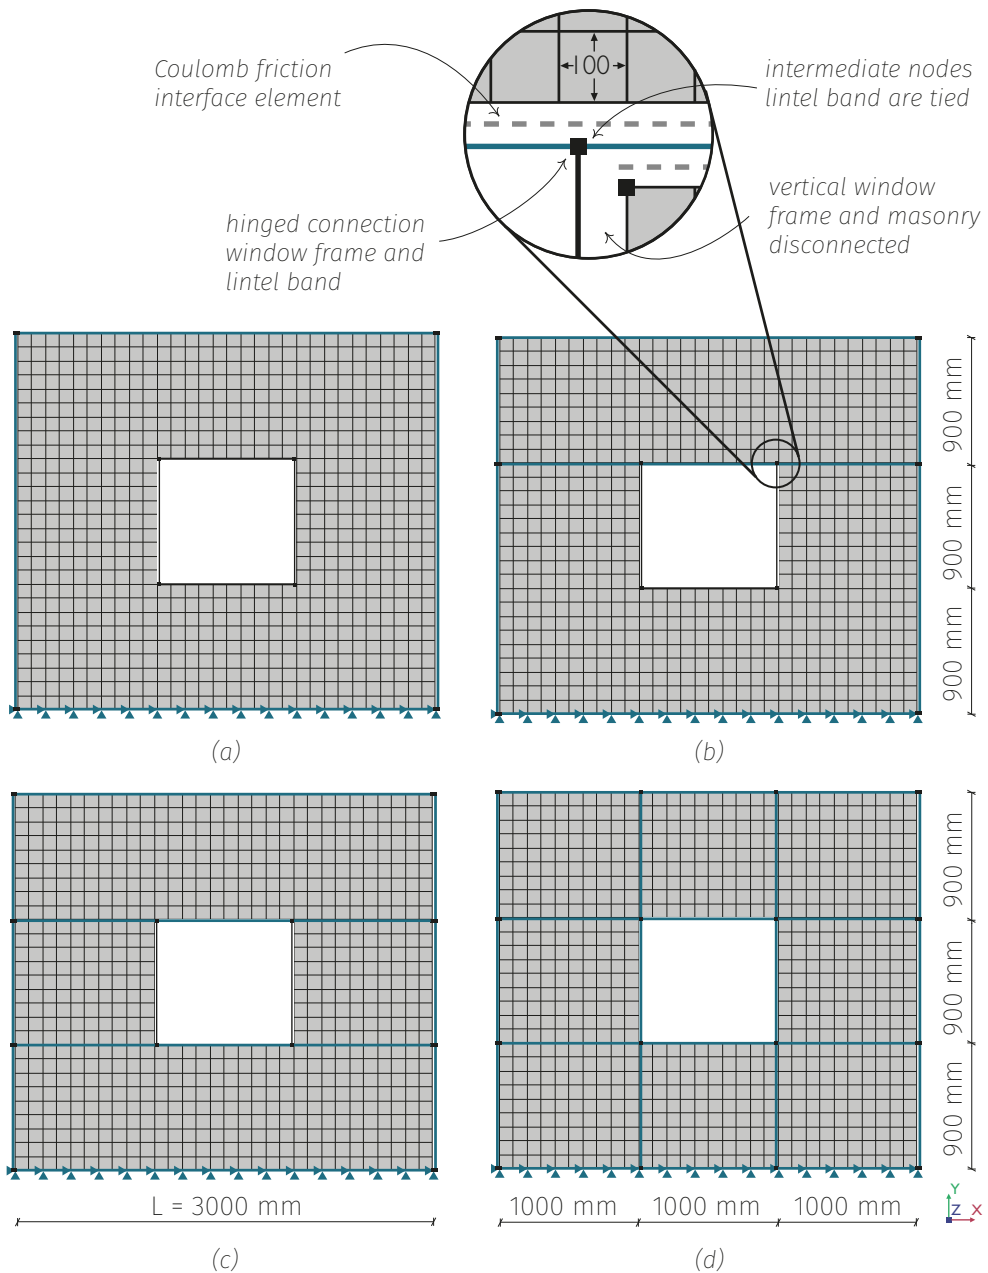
Overview of the numerical models of the masonry walls with window opening, confined by (a) two columns and roof and floor band; (b) two columns and roof, floor and lintel band; (c) two columns and roof, floor, lintel and sill band; (d) four columns and roof, floor, lintel and sill band.
